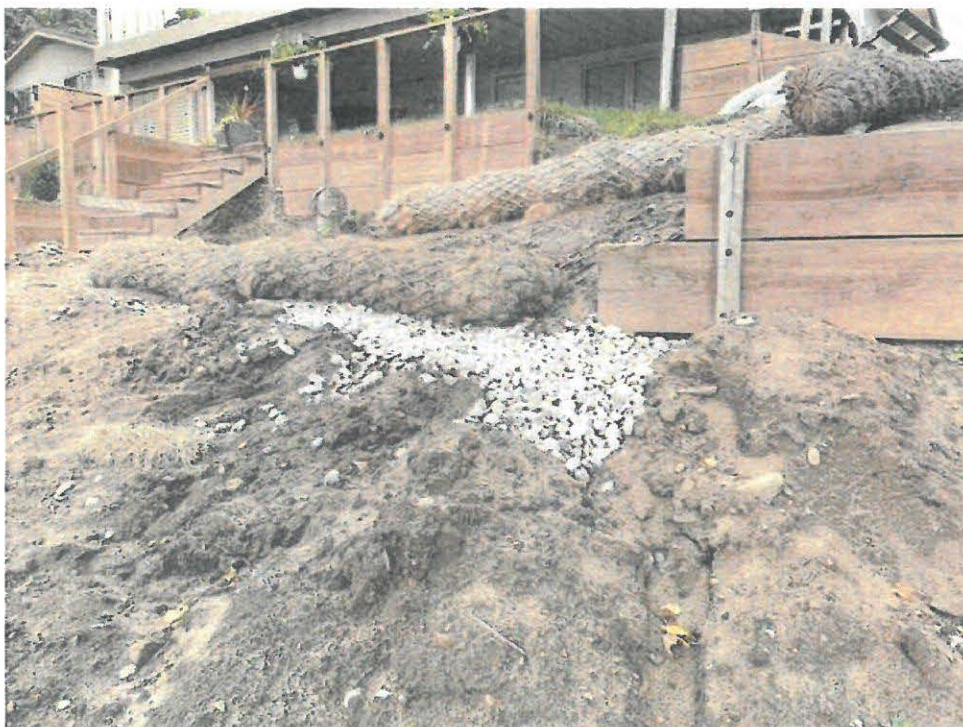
Detail of French Drain at toe of new intermediate timber retaining wall. French drain intercepts flows from lawn and directs to stone infill of lower retaining wall.
